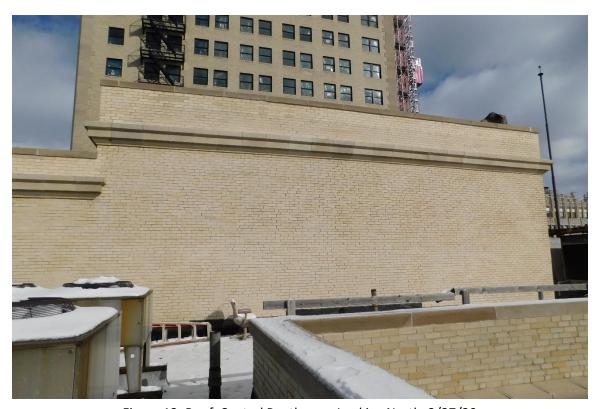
Roof, Central Penthouse, Looking North. 2/27/20
